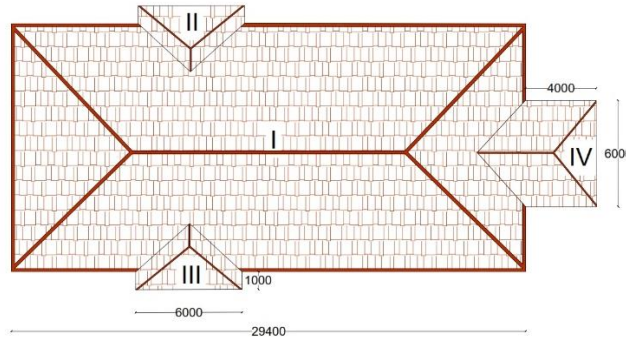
4 Layout of Overlaid Hip Roof of Abu Bakar Dormitory (Building C)
